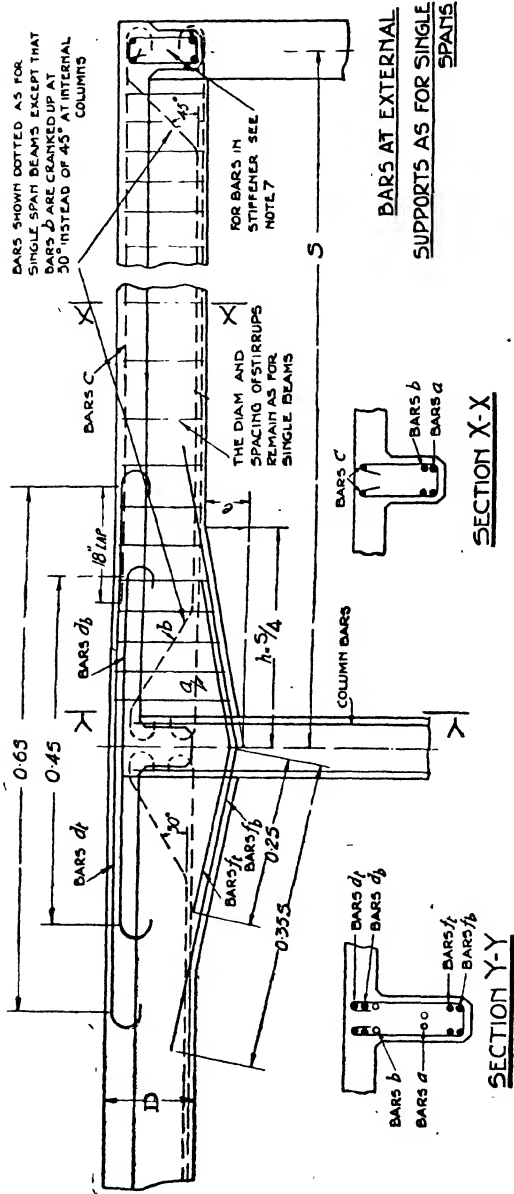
DETAIL OF CONTINUOUS BEAM AT INTERNAL SUPPORTS.
